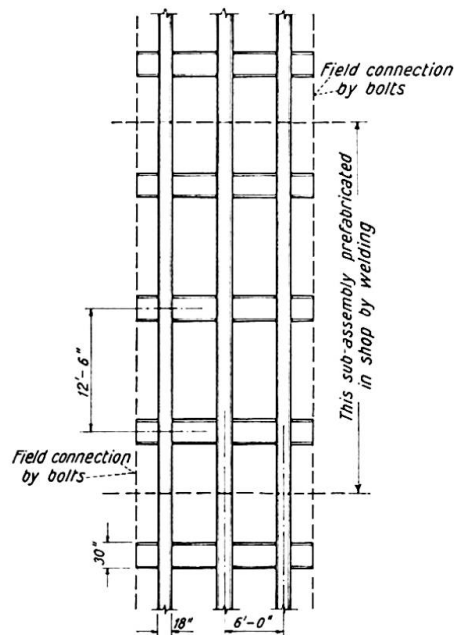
Prefabricated Units for Framed Tube Type Structures
